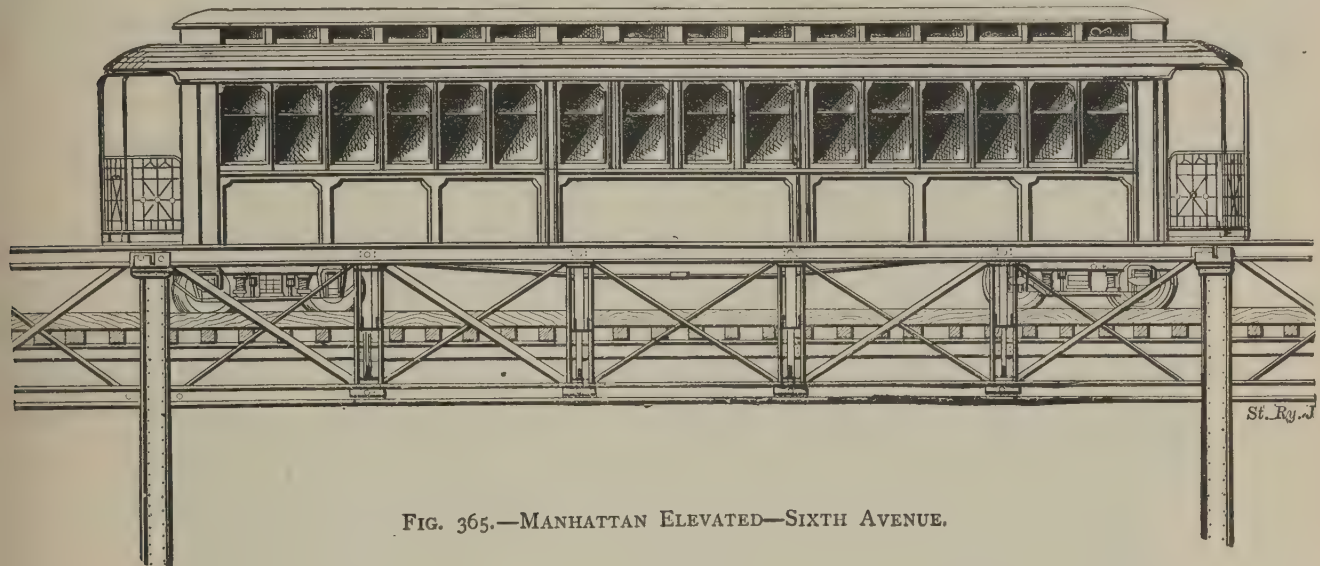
MANHATTAN ELEVATED—SIXTH AVENUE.
